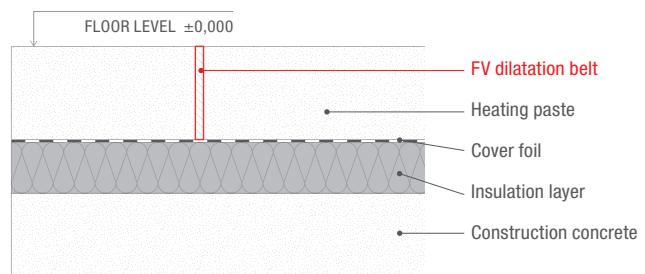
Heating paste dilatation belt when laying hard flooring (floor tiling, stone floor, laminate floor)
